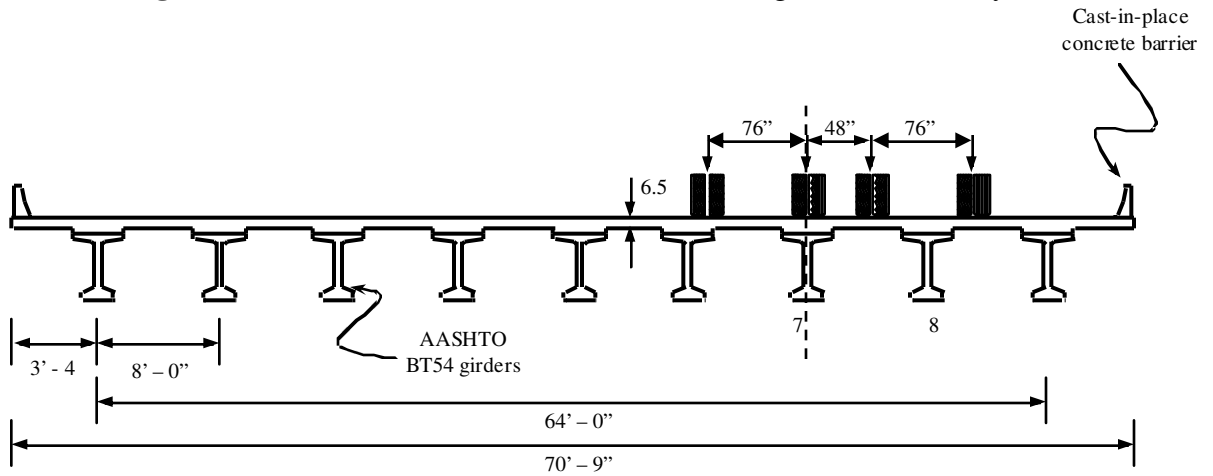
Lane B – Horizontal Truck Positioning (Static Test only)
